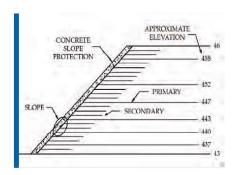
Typical cross-section for a reinforced StrataSLOPE.
